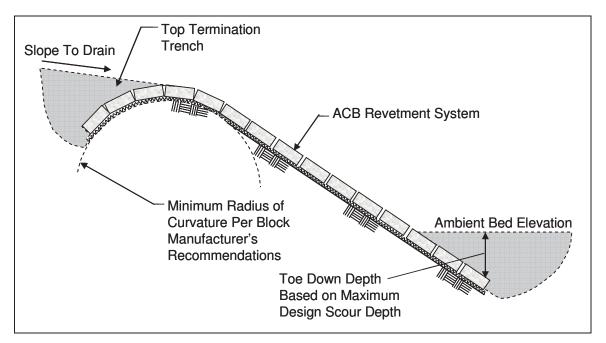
Recommended layout detail for bank revetment where no bed armor is required.
